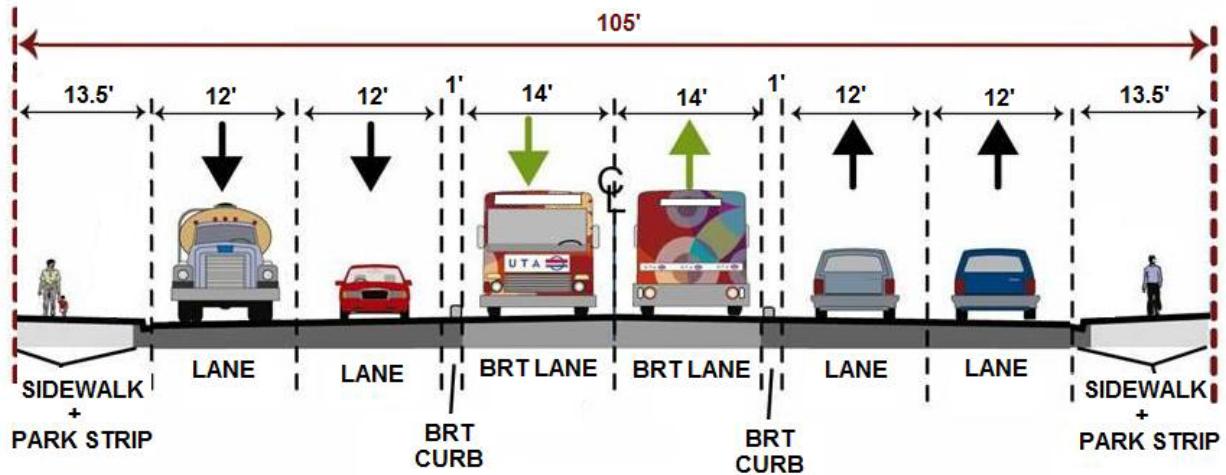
Typical Mid-Block Section of 5600 W with 28' BRT Guideway
